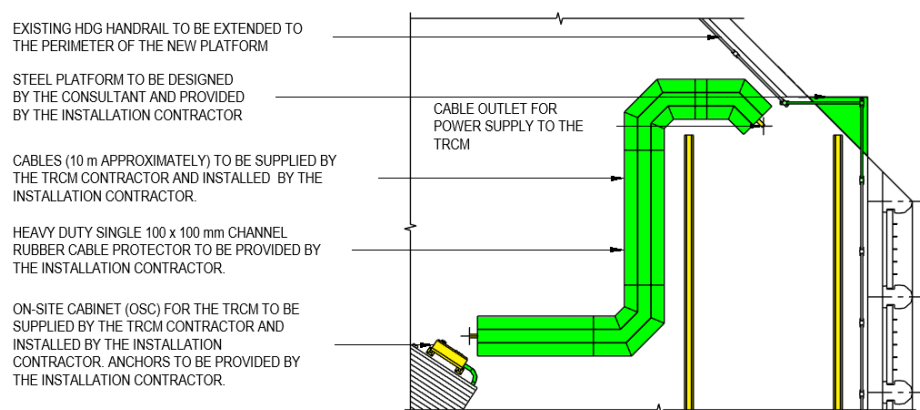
Installation of the cable protectors and platform (refer to drawing 1003061-1000-DRG-CC-0005-T0)
